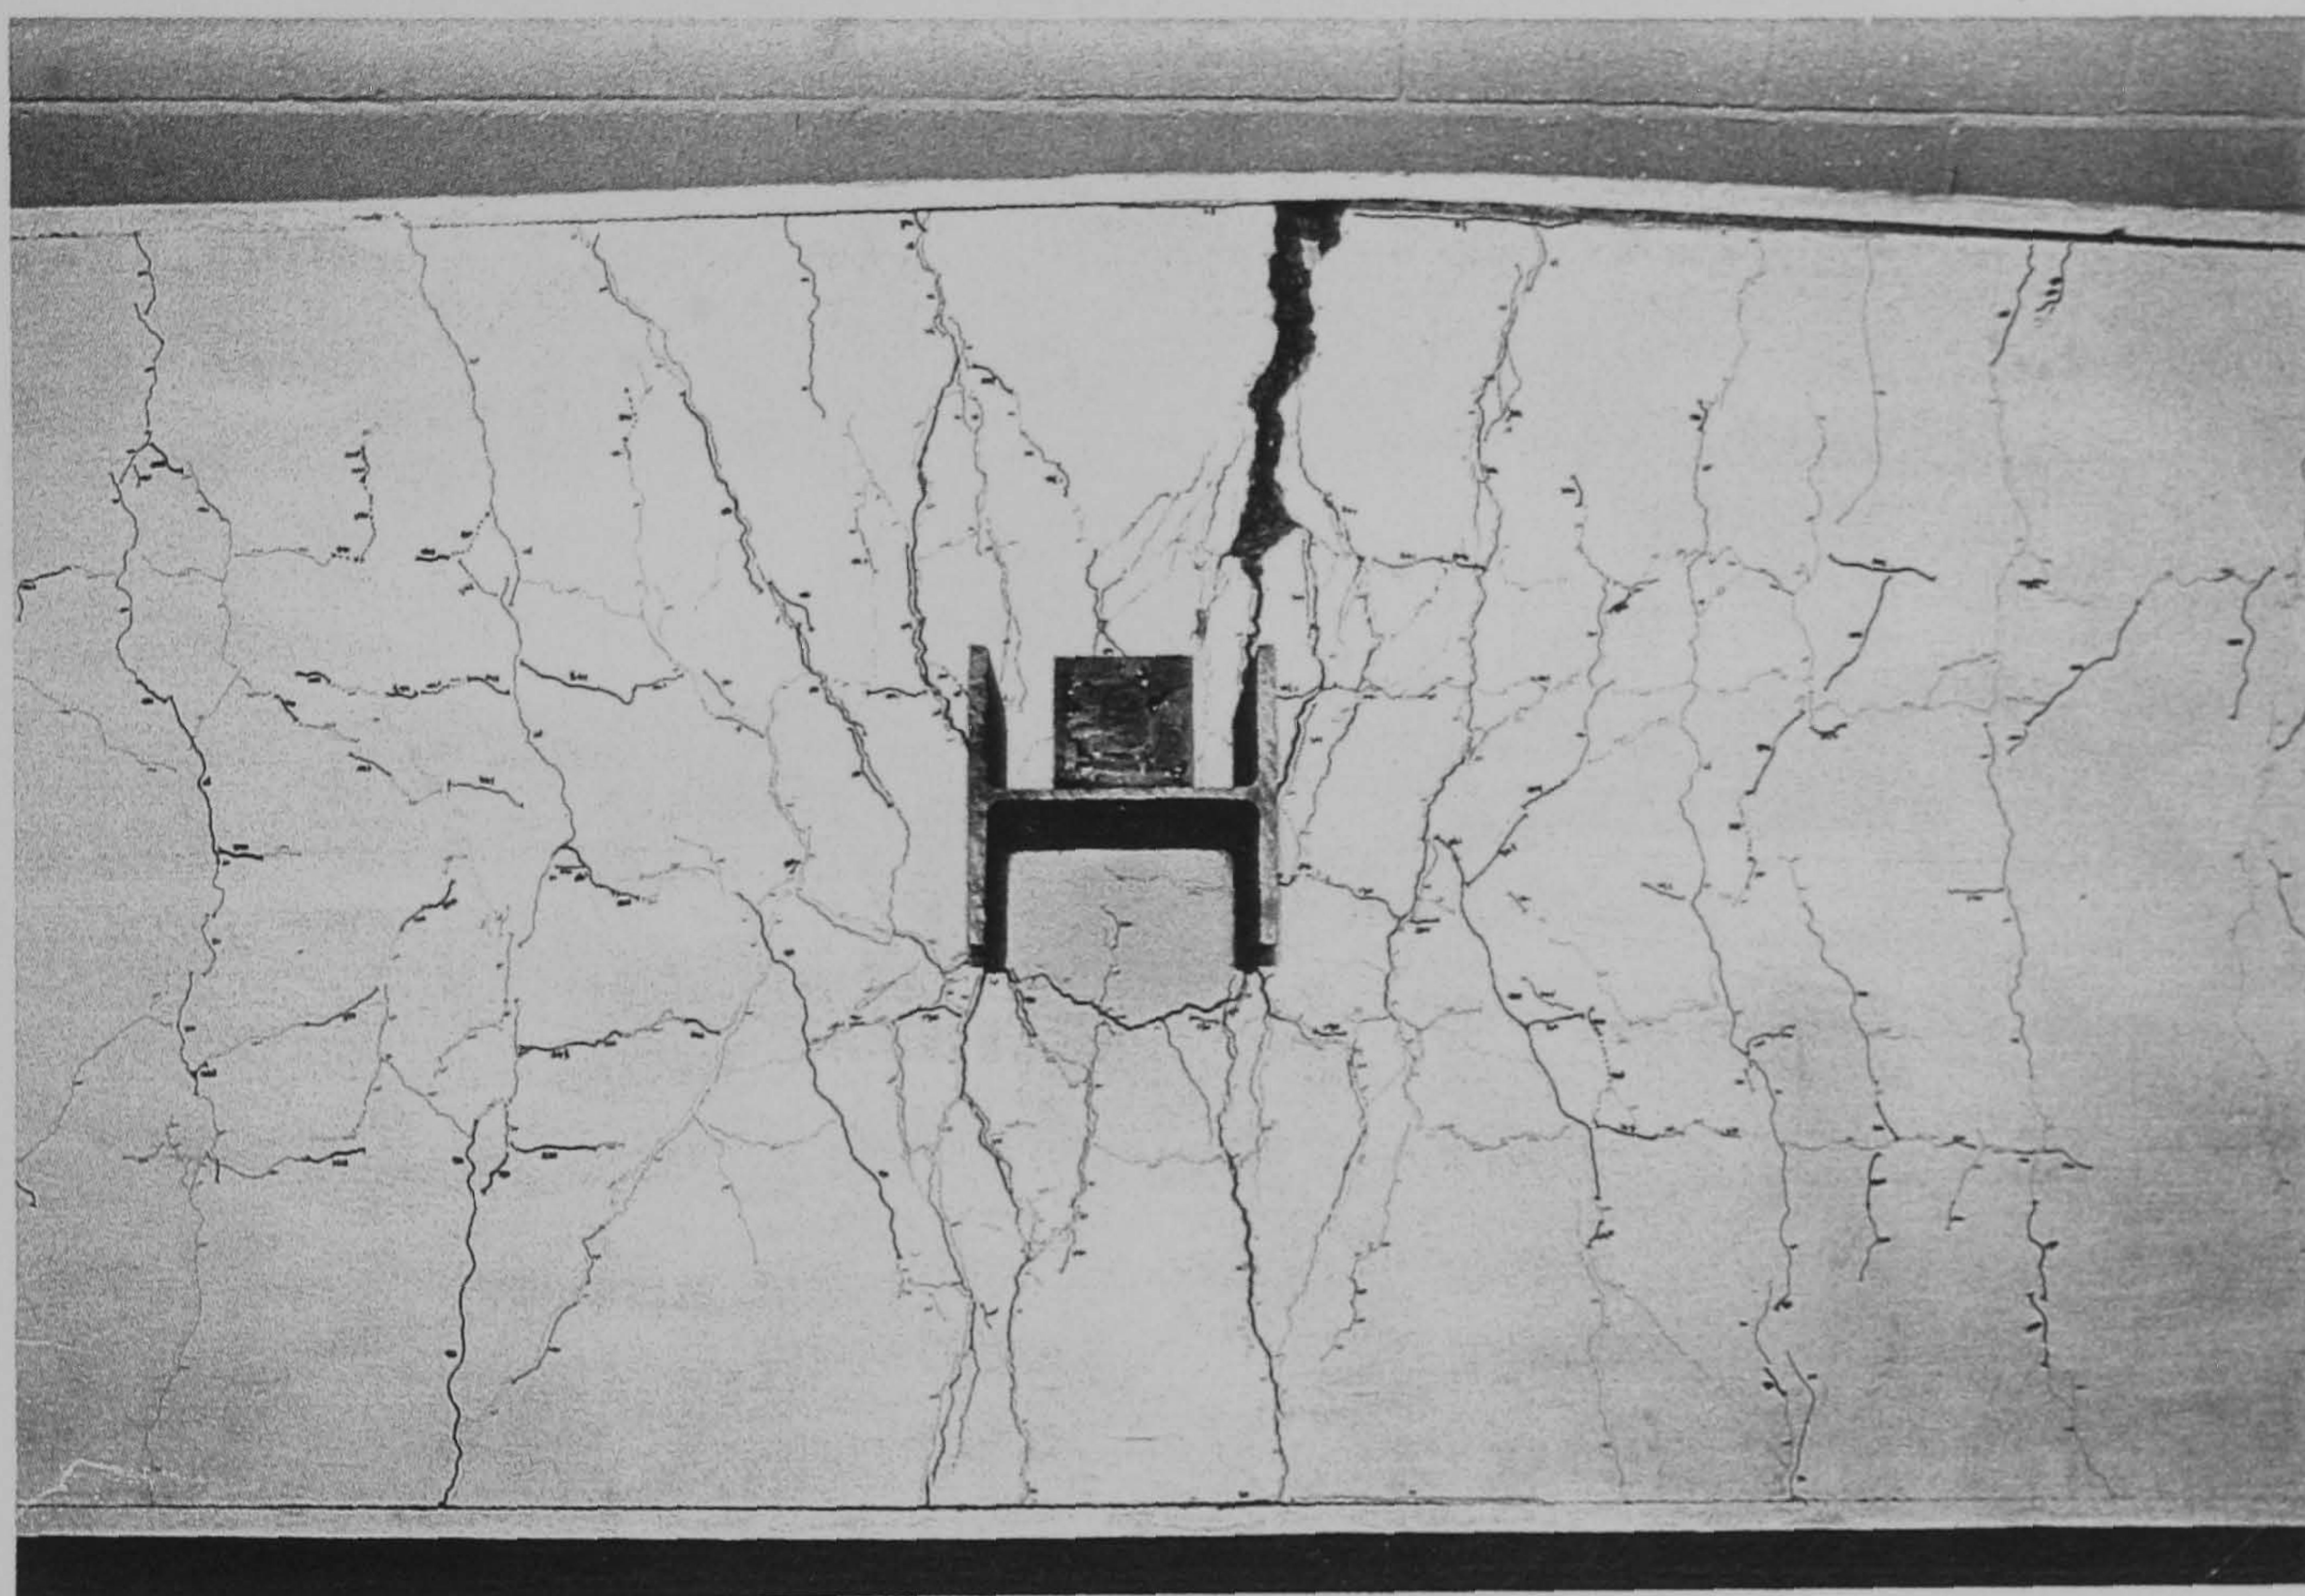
Test 2 : concrete slab crack pattern
